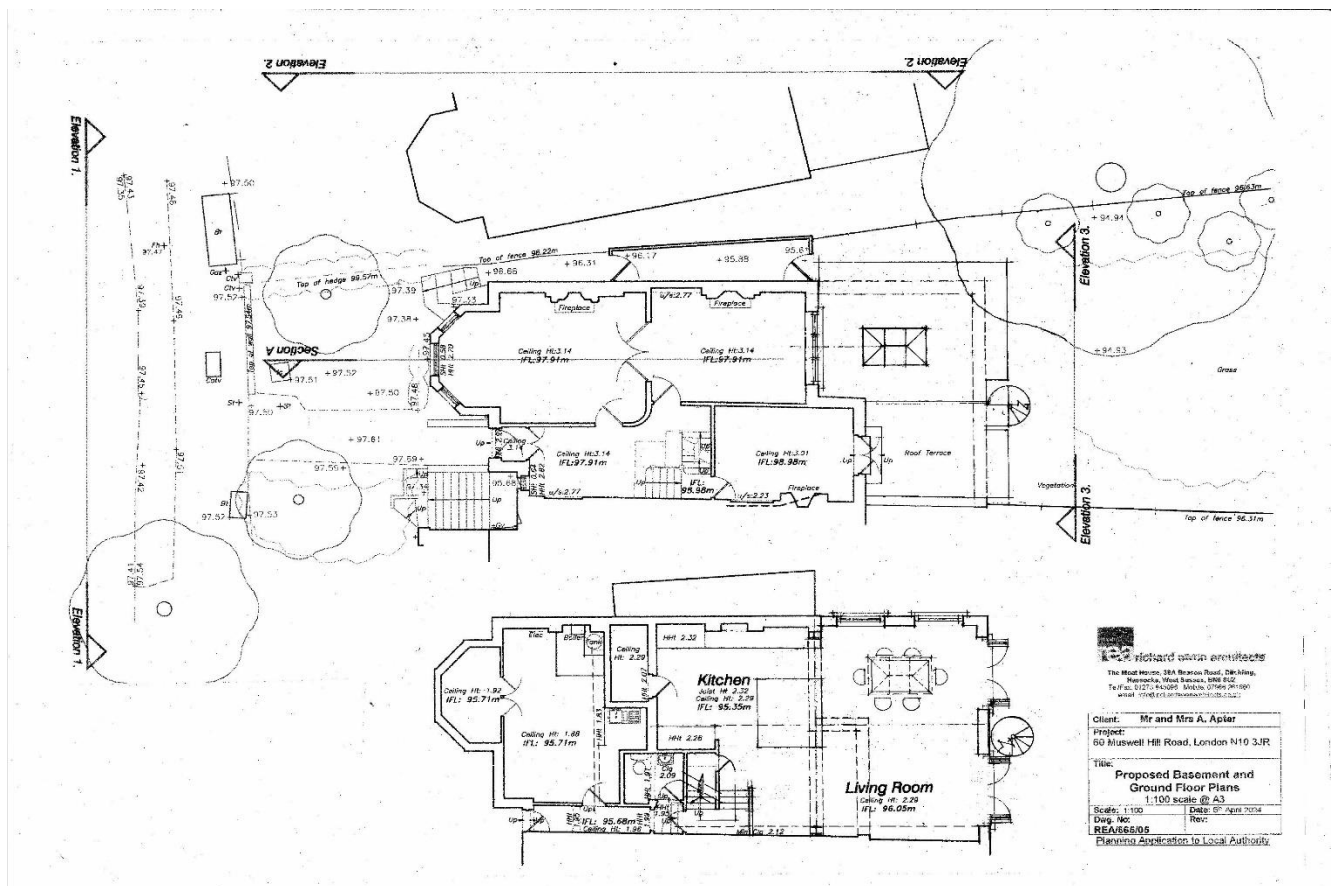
60 Muswell Hill Road – Proposed Basement and Ground Floor Plan.
